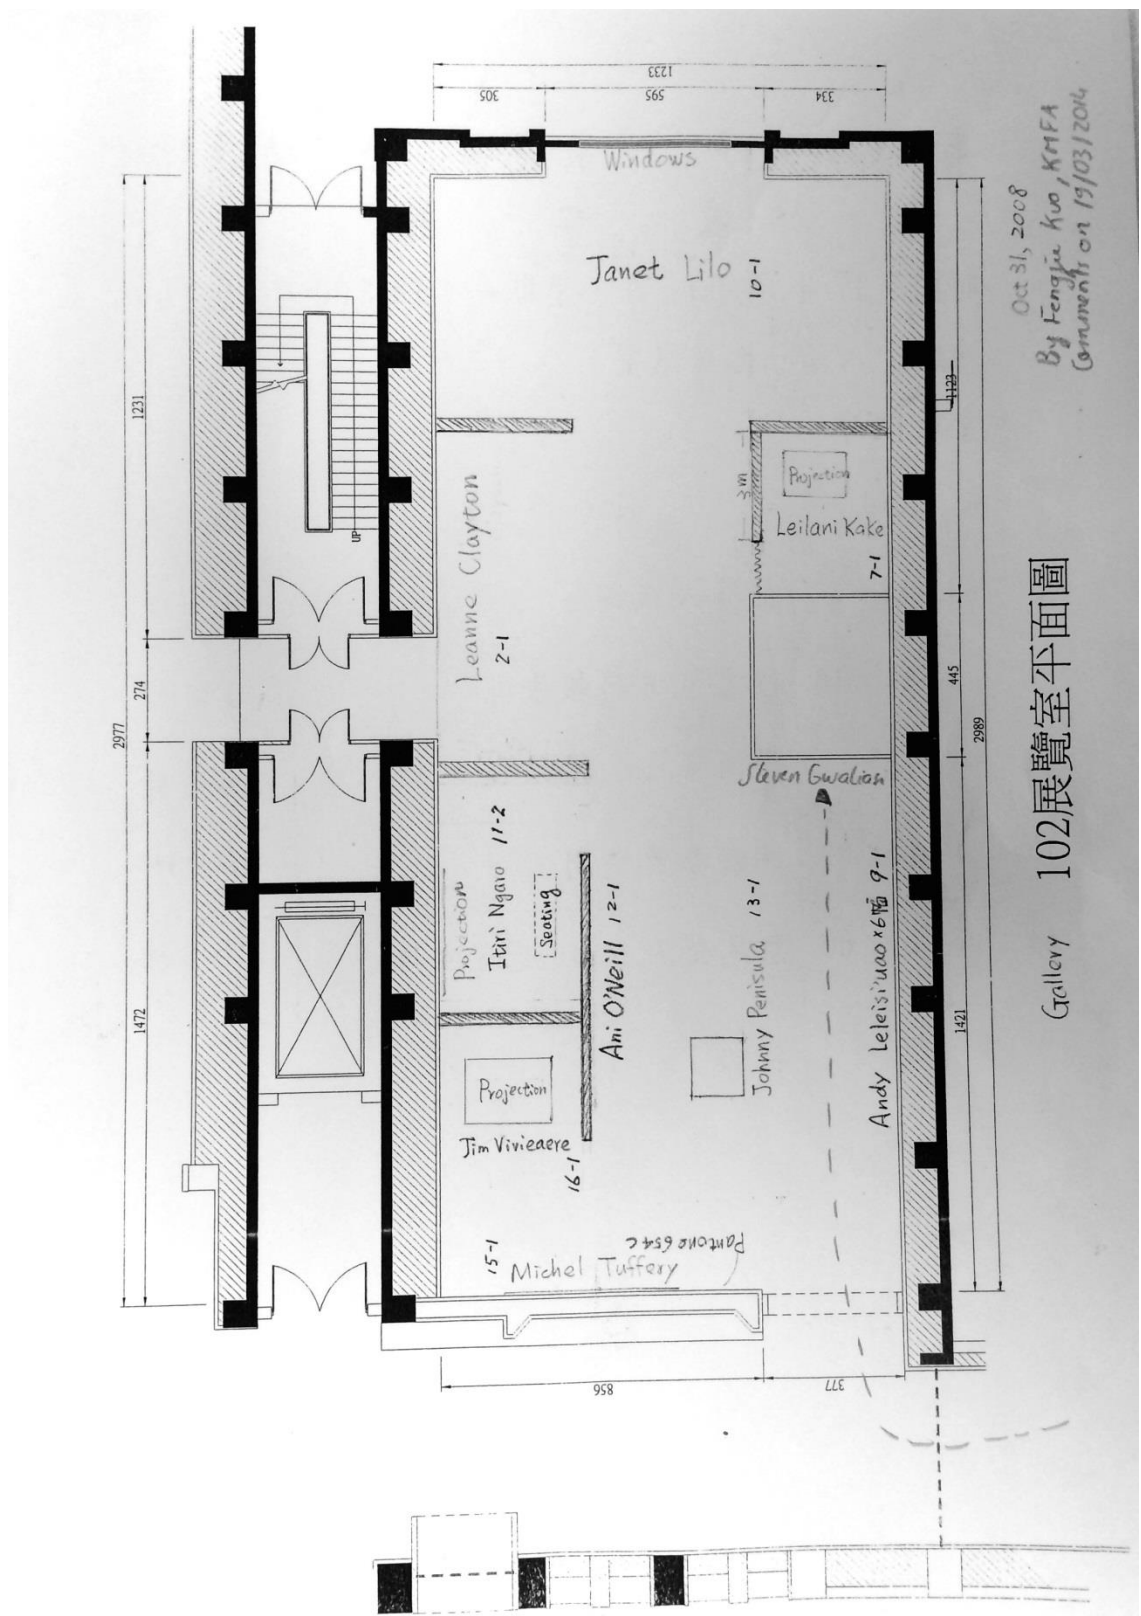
Floor plans, Room 102, LF Taiwan. KMFA archives, 31 October 2008
